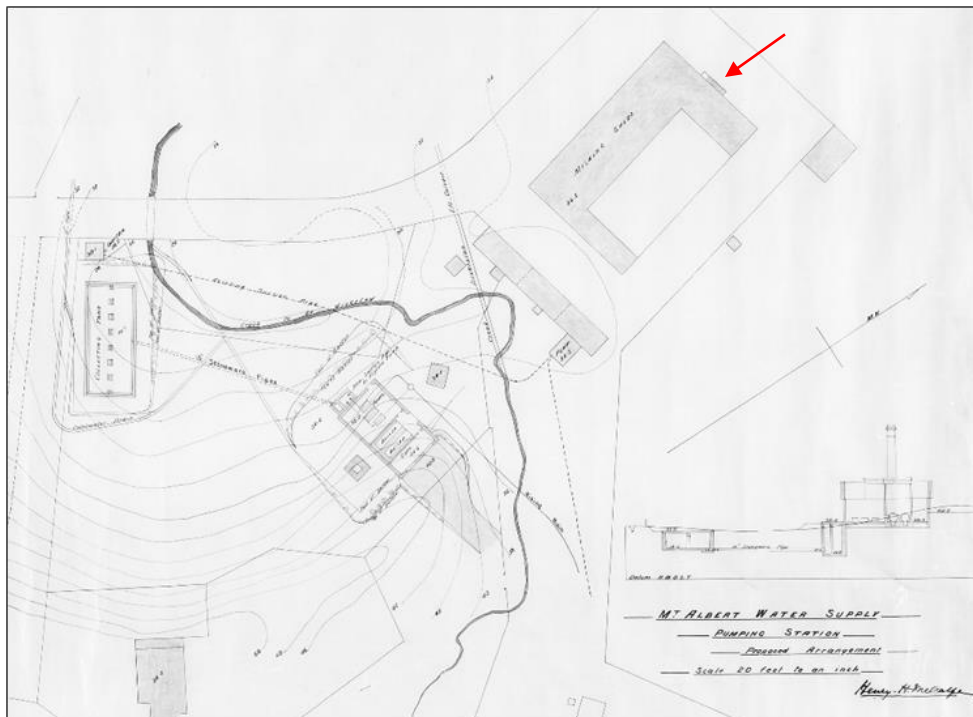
A 1903 site plan showing a u-shaped arrangement of milking sheds to the north of the proposed pumping station. R25332062 Archives NZ Wellington repository.
